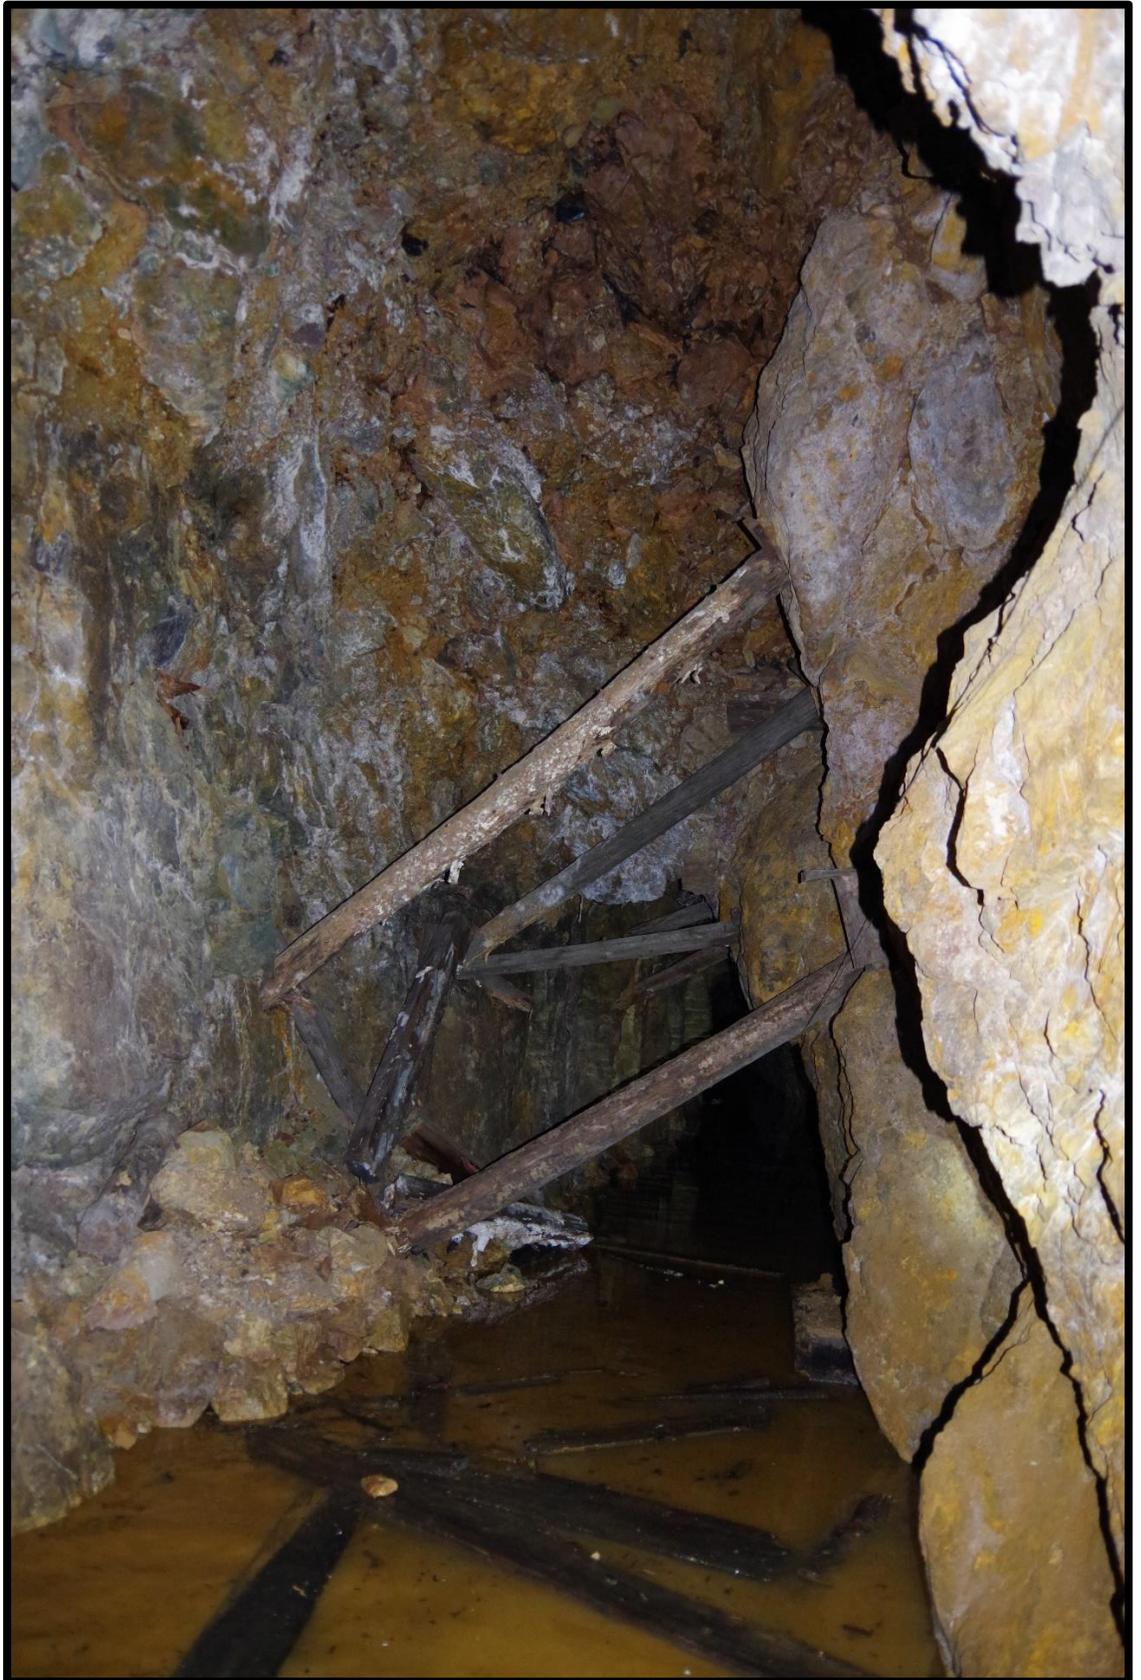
Large loose slabs in hanging wall near 38+10; View is outby
